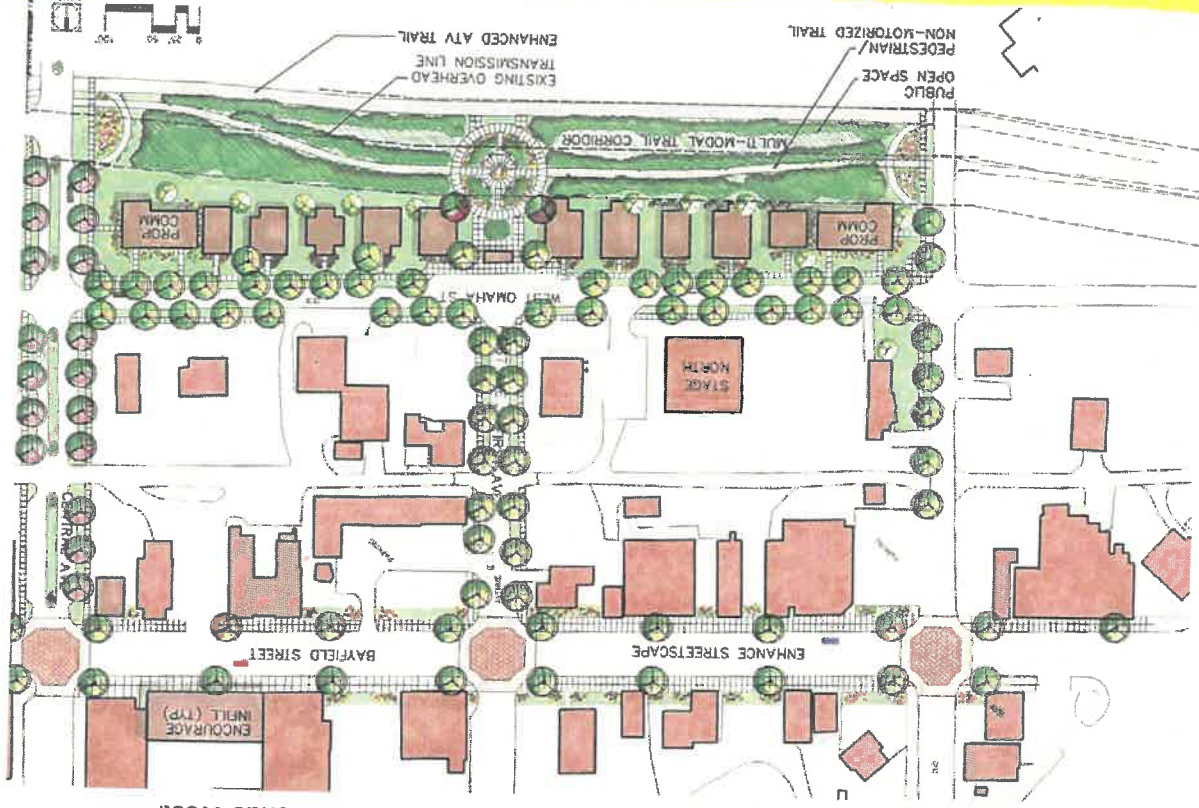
Conceptual Sketch Showing Preliminary Ideas for Redevelopment of Central Avenue from Bayfield Street to Omaha Street
